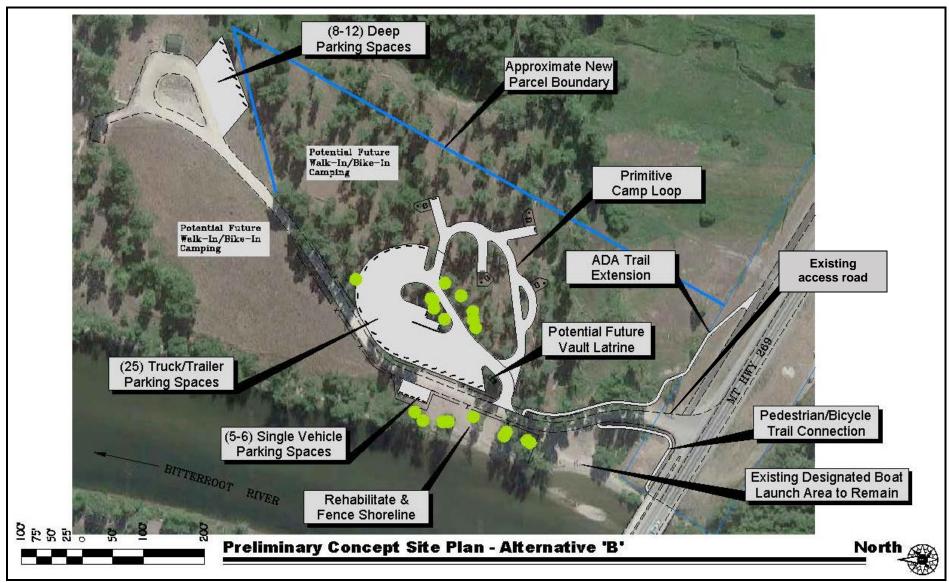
Preliminary Concept Site Plan for development of the proposed Stevensville Bridge FAS; Proposed Action (Alternative B; see Section 10).
